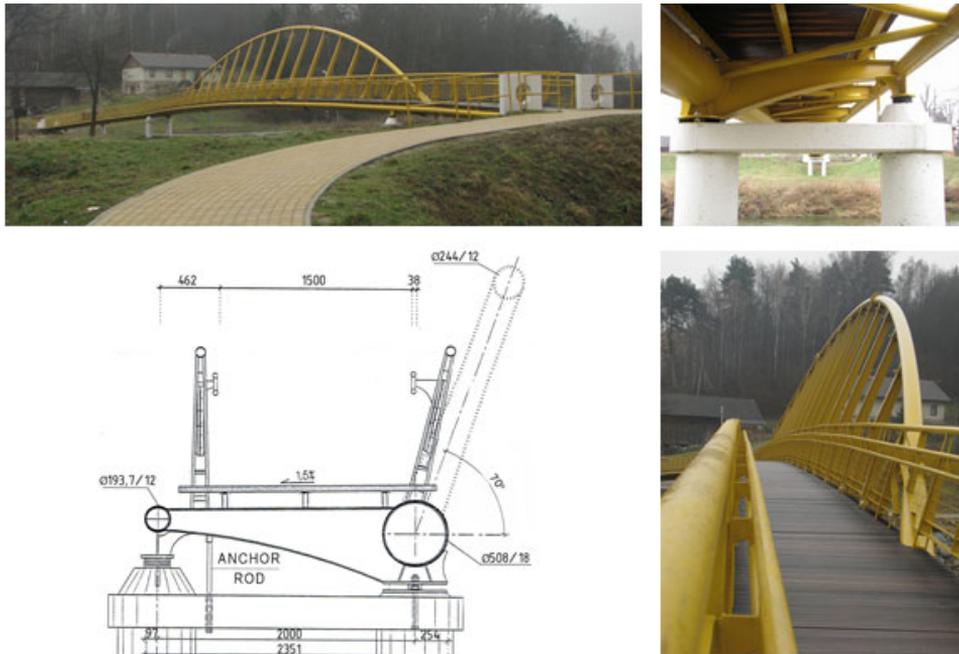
Arch footbridge in Łapanów, Poland (Engineering Studio Project s.c.).
